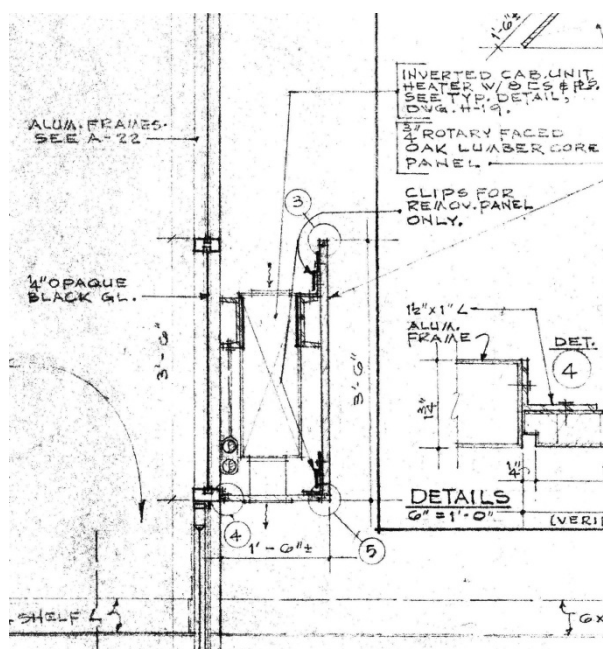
Detail of typical cabinet unit heater at two-story exterior door assembly head. [From 1968 Drawing A-24]
